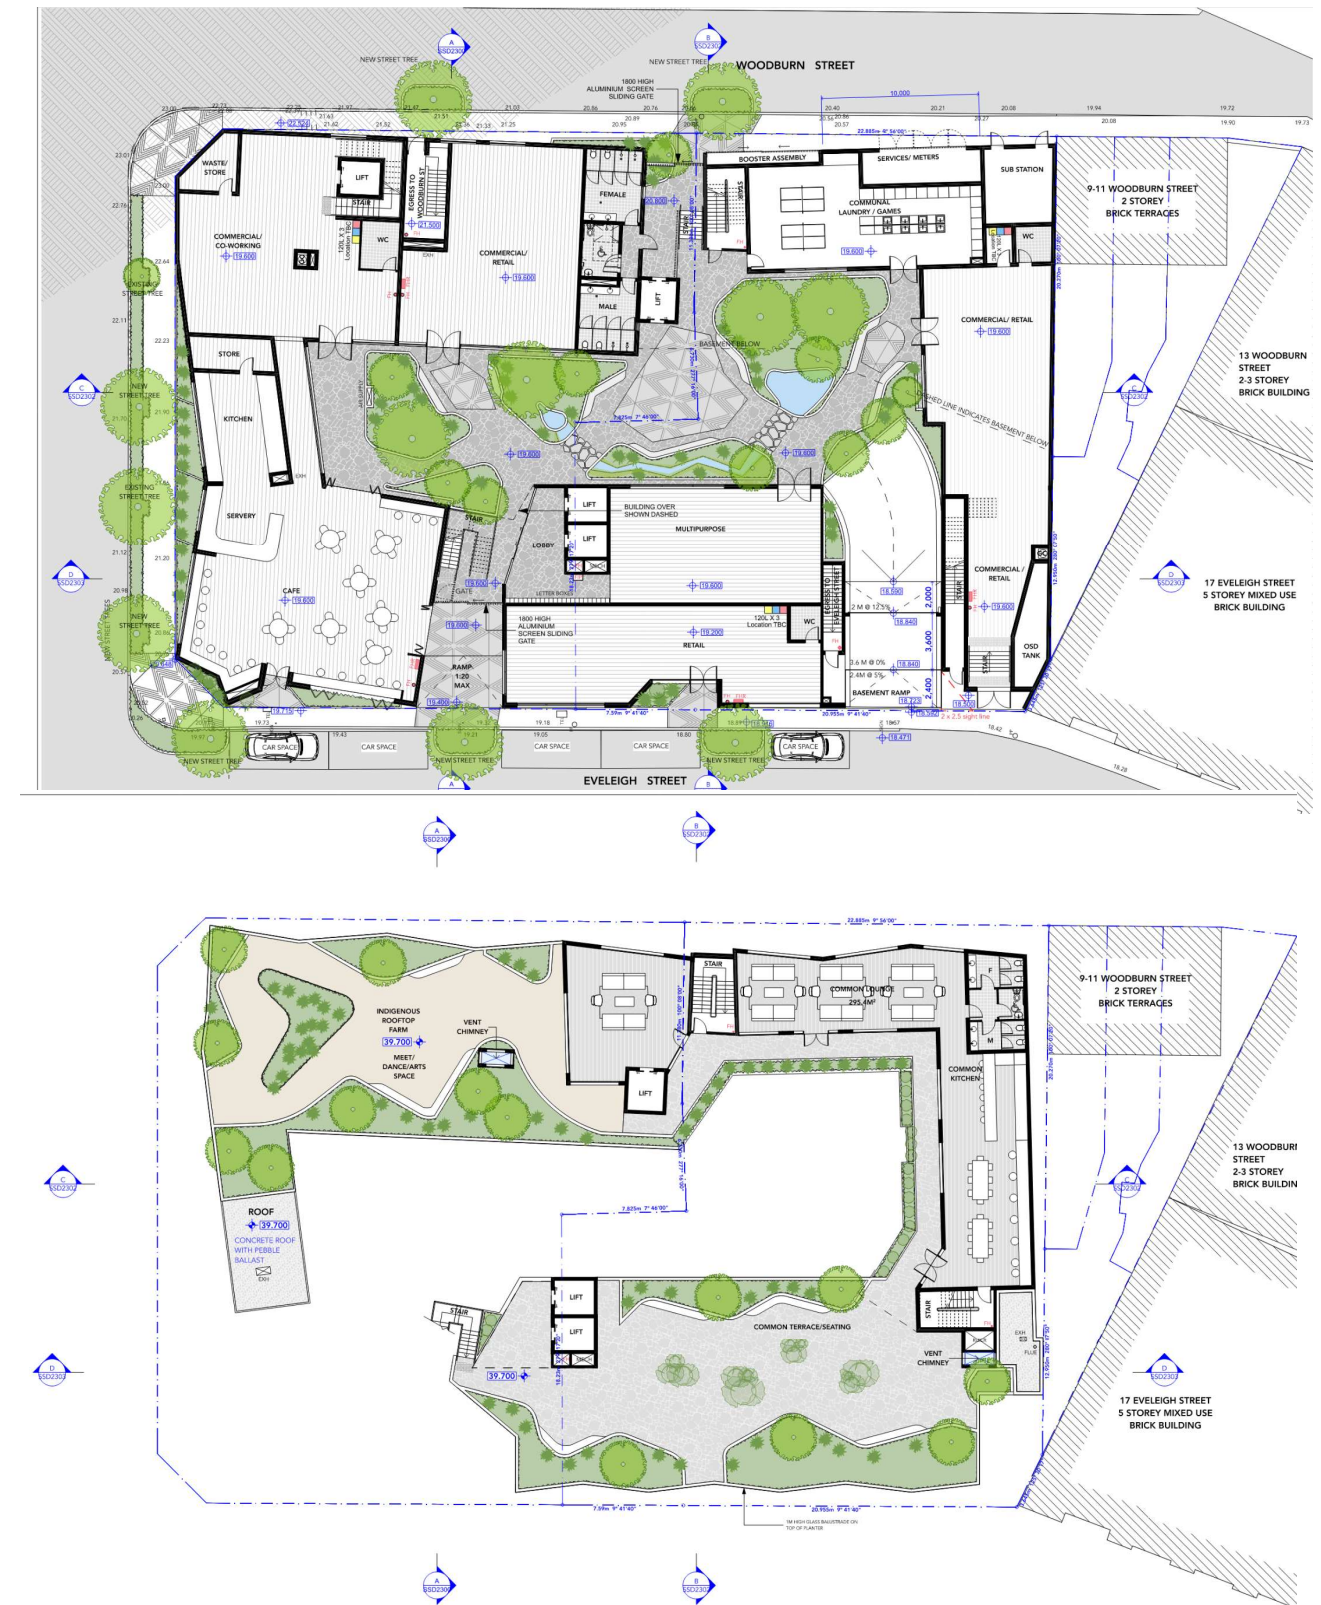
Plans showing the extent of vegetation and wetlands on ground floor and the rooftop terrace.
